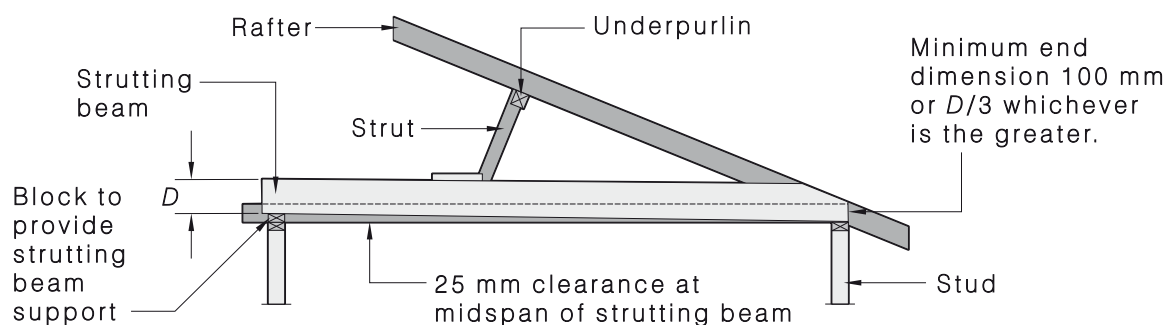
INSTALLATION OF STRUTTING BEAMS
